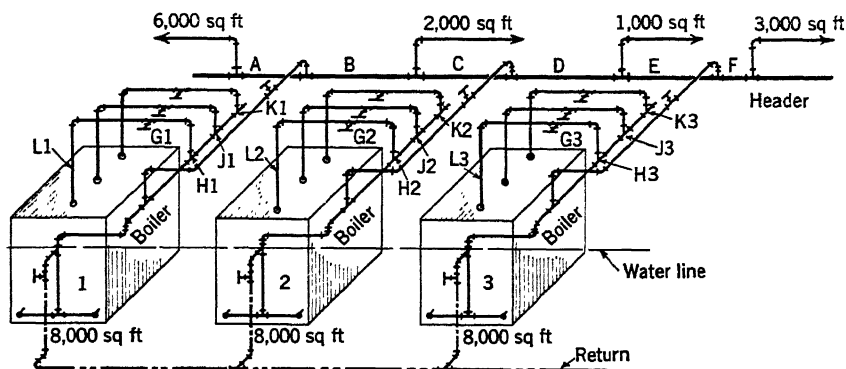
BOILER STEAM HEADER AND CONNECTIONS
